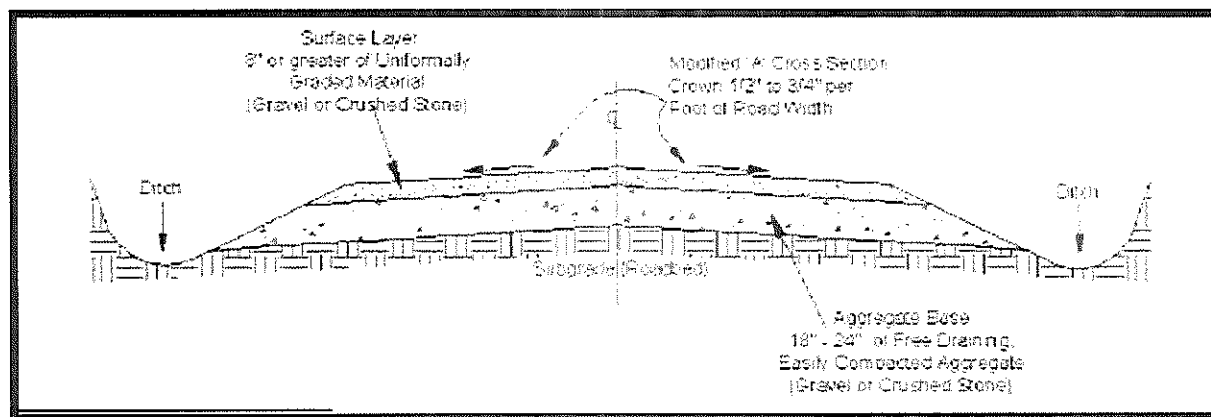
Typical Section for Gravel Roads – State of Massachusetts
